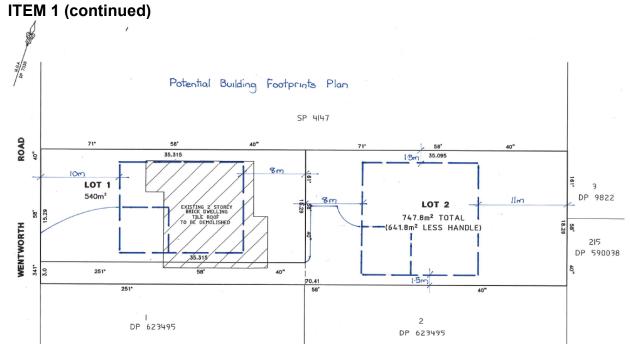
Extract of the Potential Building Footprints Plan (the potential building footprints, driveways and setbacks are marked in blue).
